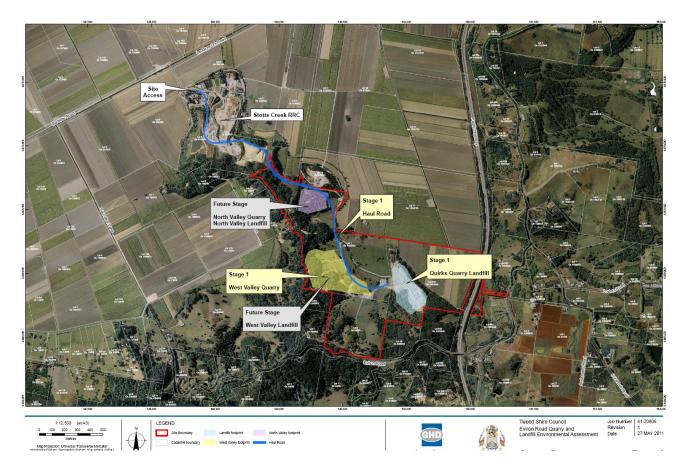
Concept Plan for Eviron Road, Quarry and Landfill Site
